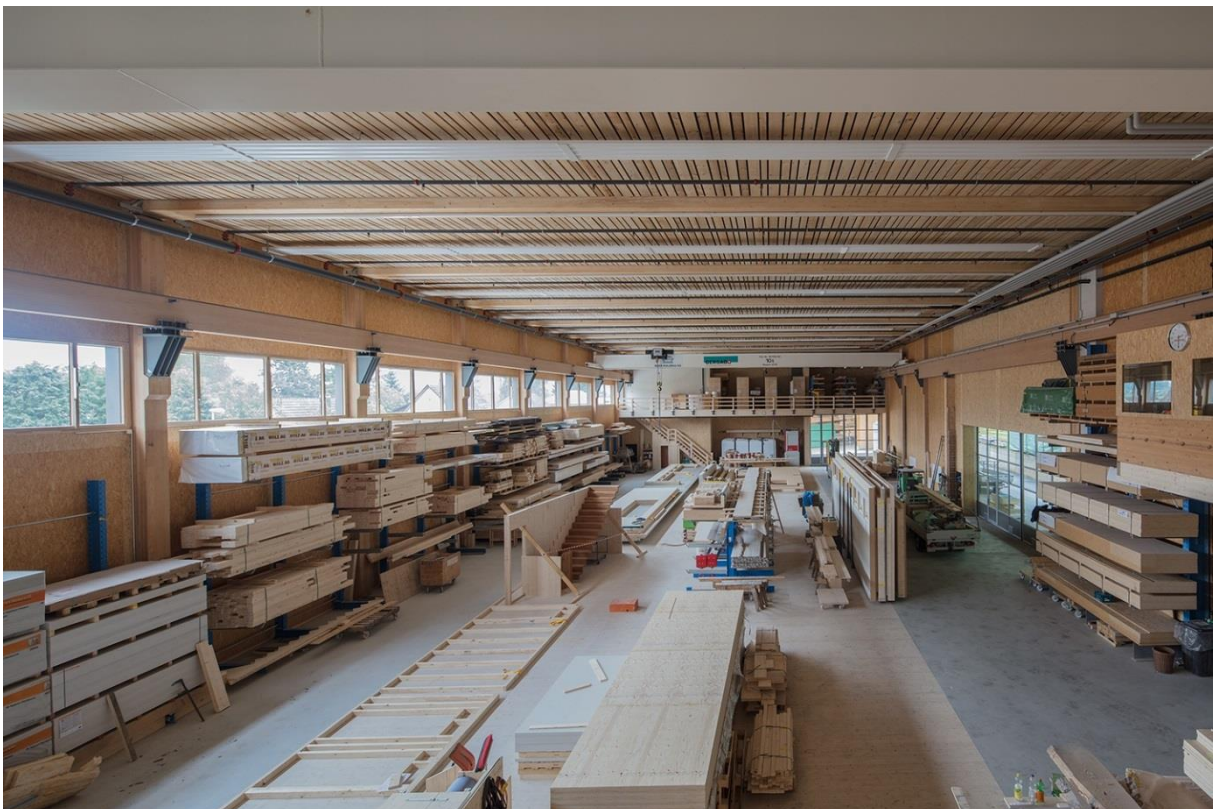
"FachWerk" building including production facility, offices and residential units: the glued, reinforced beechwood crane runway is mounted on spring elements for noise reduction. (Image source: Beer Holzbau AG, Ostermundigen BE)
